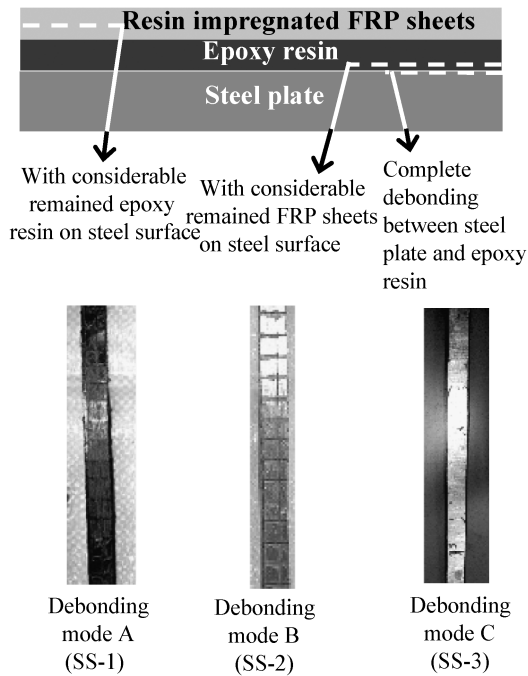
Debonding modes of steel plate-FRP sheets bonding joints.
